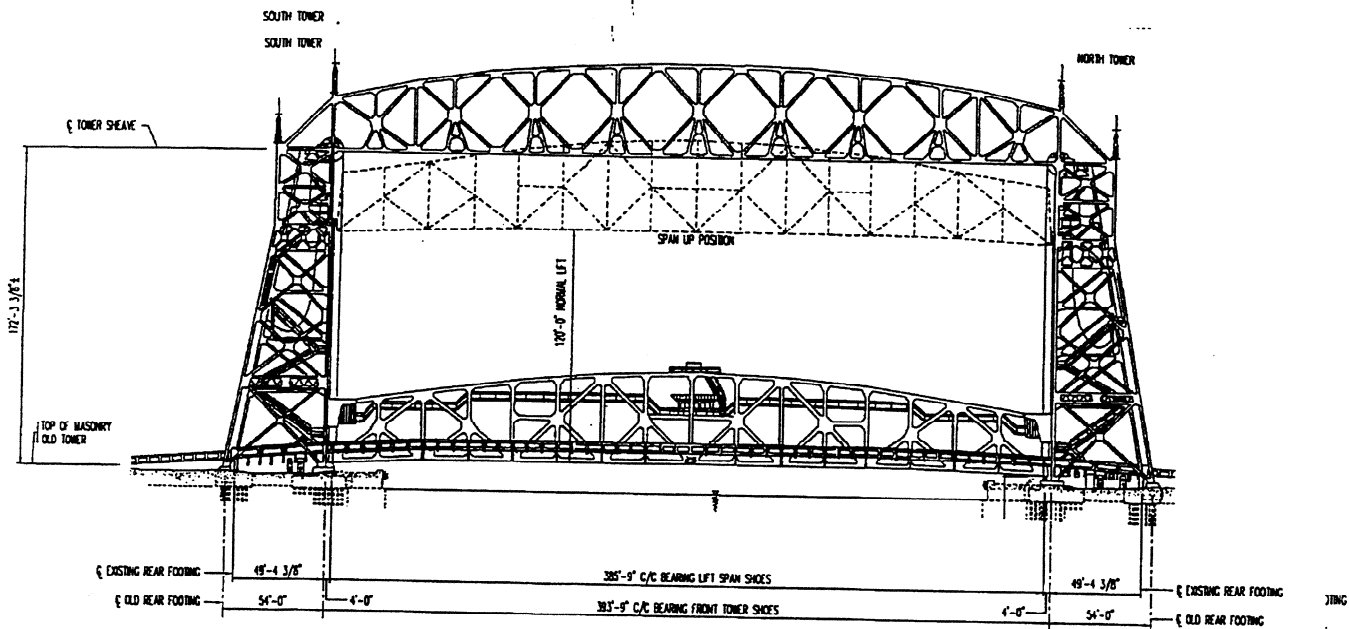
Elevation of Duluth Aerial Lift Bridge
